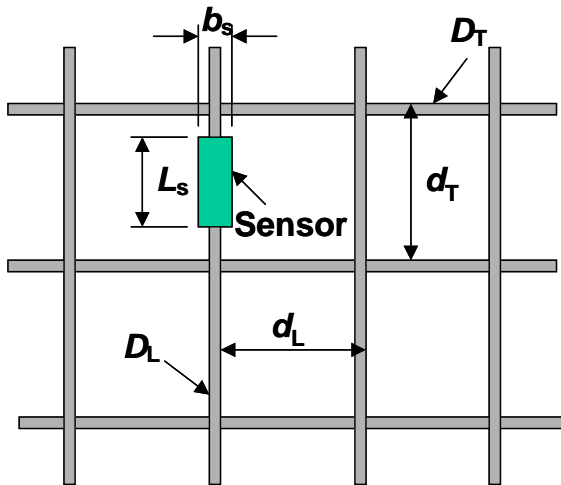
Illustration of reinforcement network in a real concrete structure.
